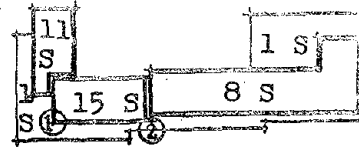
Damage condition of civil aviation building, Beijing: (1) Connection of ground floor of the 15-storey & brick wall of the 1-st. blocks cracked; (2) The aseismic joint of the 15- and the 8-storey blocks was not extended to the exterior wall of the 1-storey block cracked
